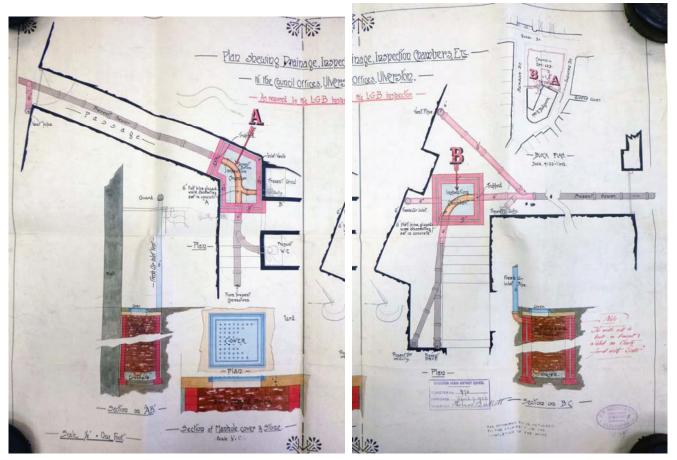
(left): Plan showing drainage, dated 1903 (north is to the left) (CAC(B) Z/1028/2 1901-1904) Plate 40 (right): Plan showing drainage, dated 1903 (north is to the left) (CAC(B) Z/1028/2 1901-1904)
